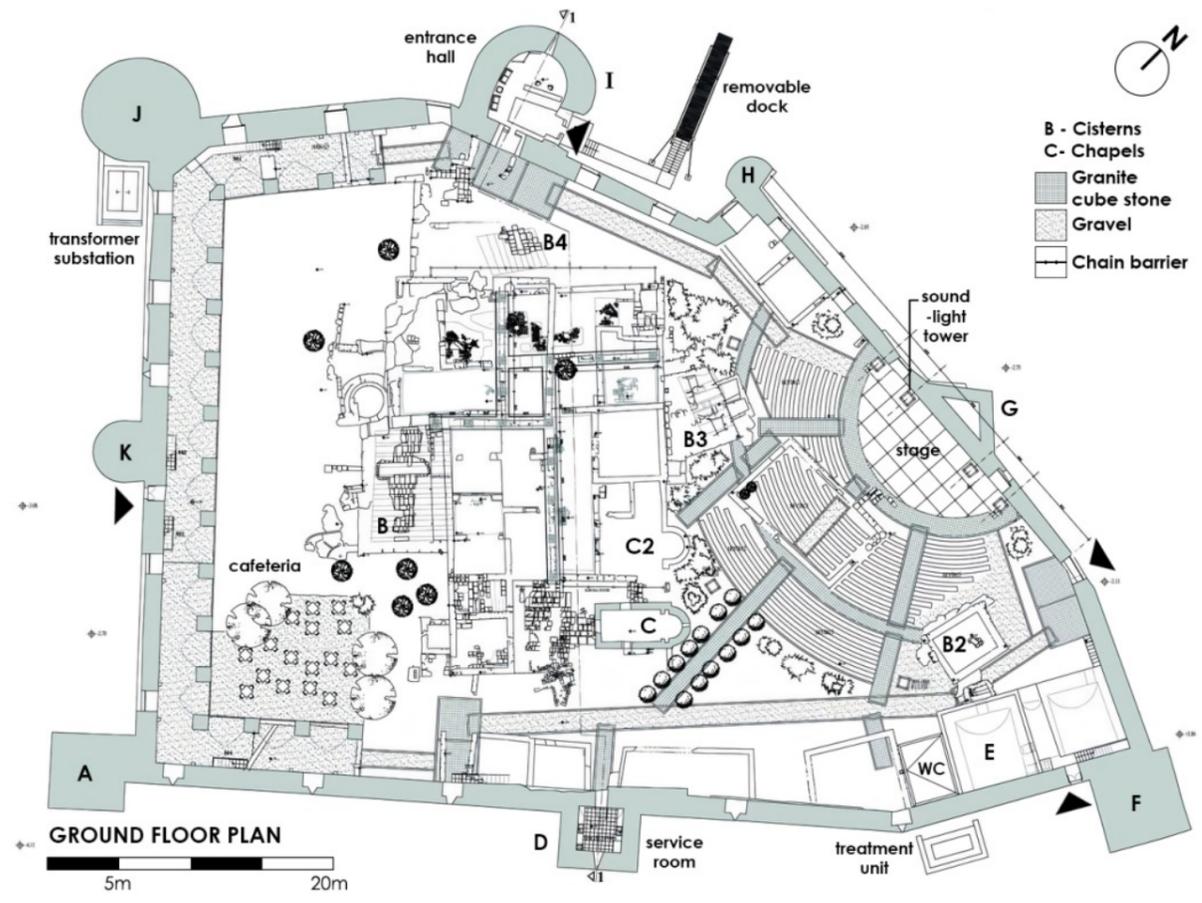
Ground floor plan of the castle, restoration drawing (Source: Miyar Mimarlık Mühendislik, 2020)
